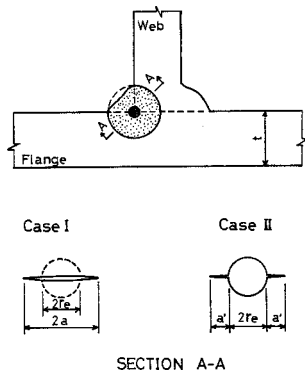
Fatigue Crack Propagation Model of Welded Beams, where Crack Initiates and Propagates from Weld Porosity.
